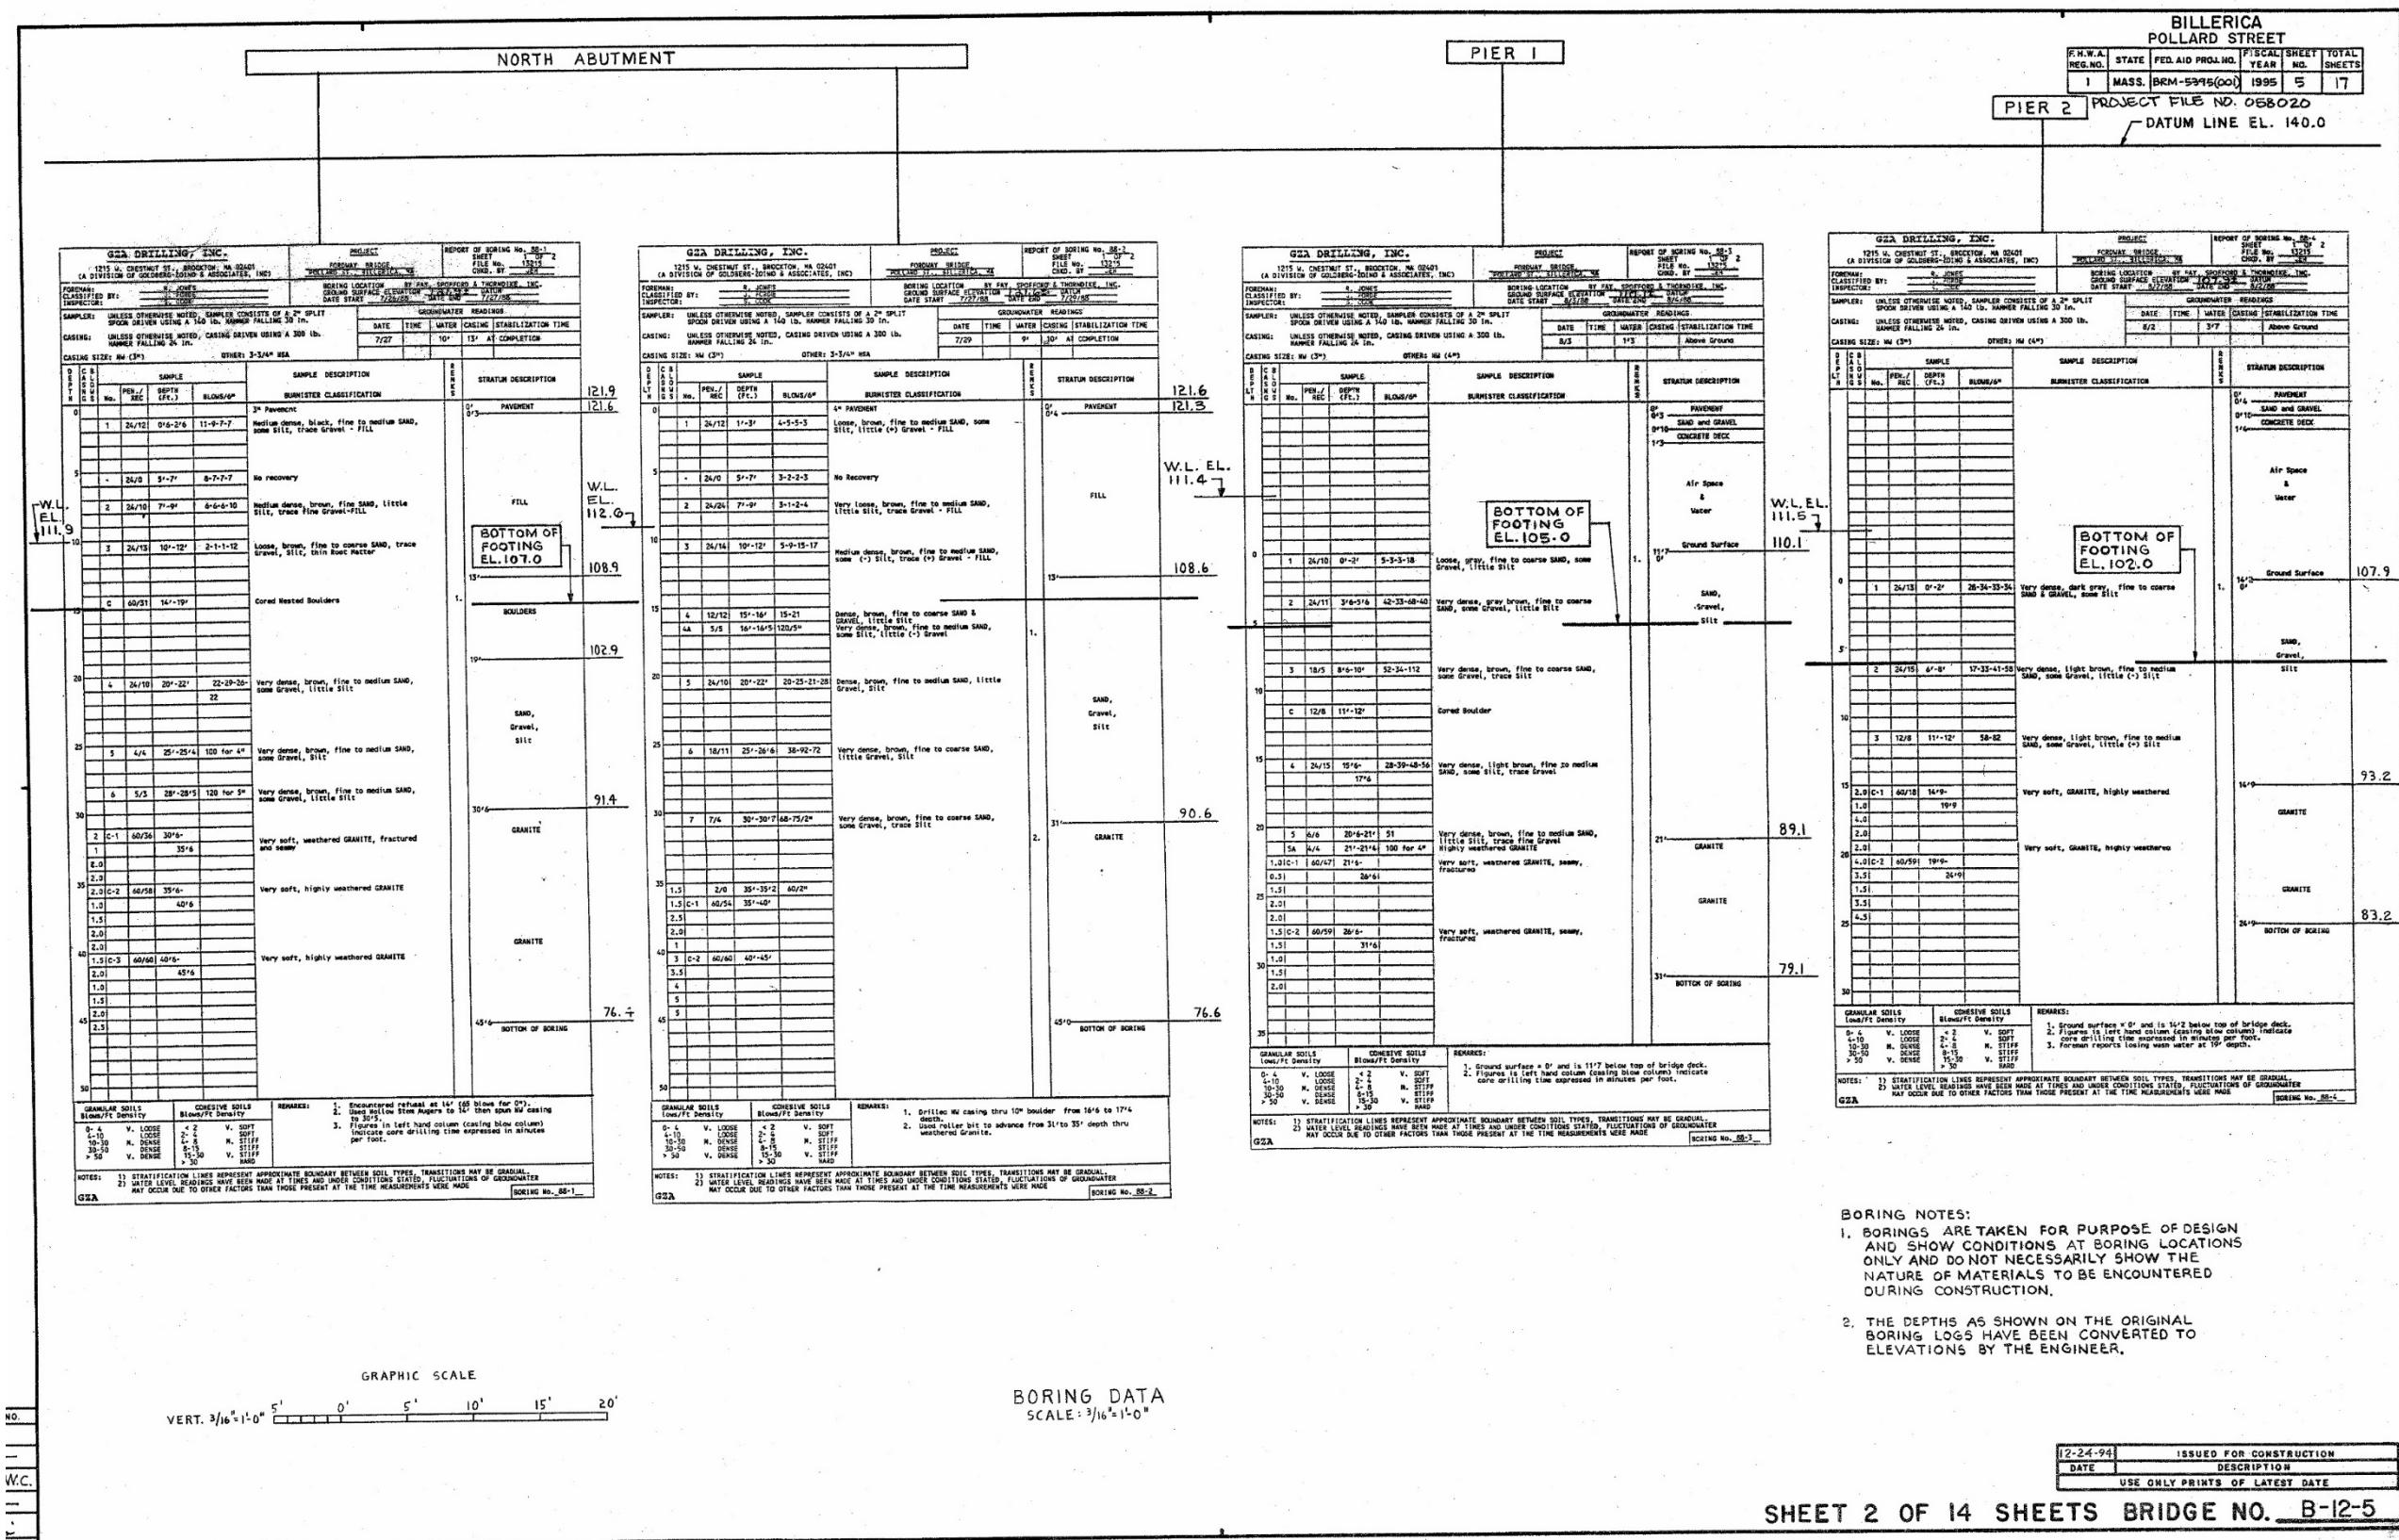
Pollard Street Bridge Boring Logs (2 of 2)
